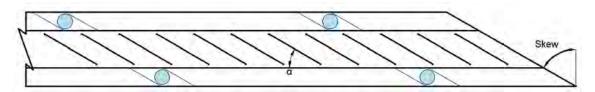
Plan View of 60 Degrees Skewed ITBC
